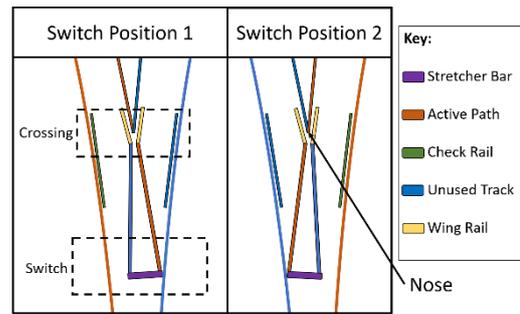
SWITCH AND CROSSING (S&C) LAYOUT.
